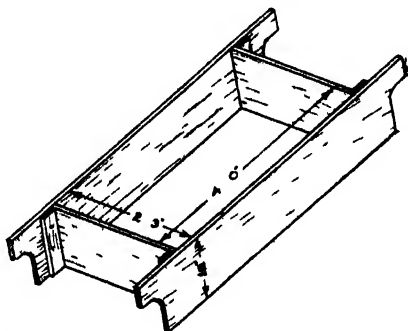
Sketch of Gauging Box for Mixing Concrete.
